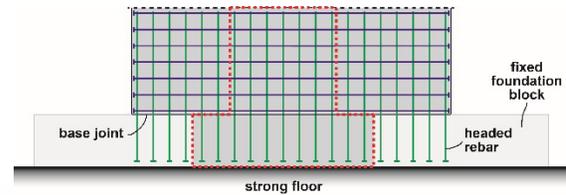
Vertical wall slice from capstone wall as basis of a deep beam specimen.
